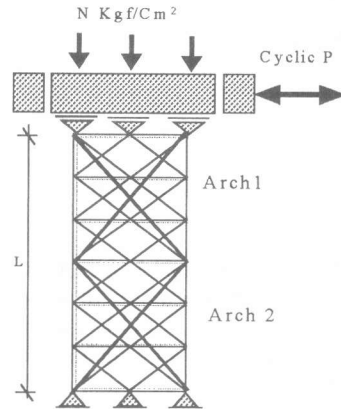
3-D Lattice Model for Reinforced Concrete Column
